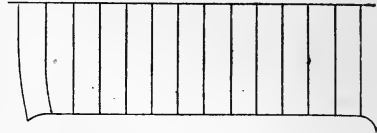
Plan of Straight Stair with Cylinder at Top for Return Rail.
